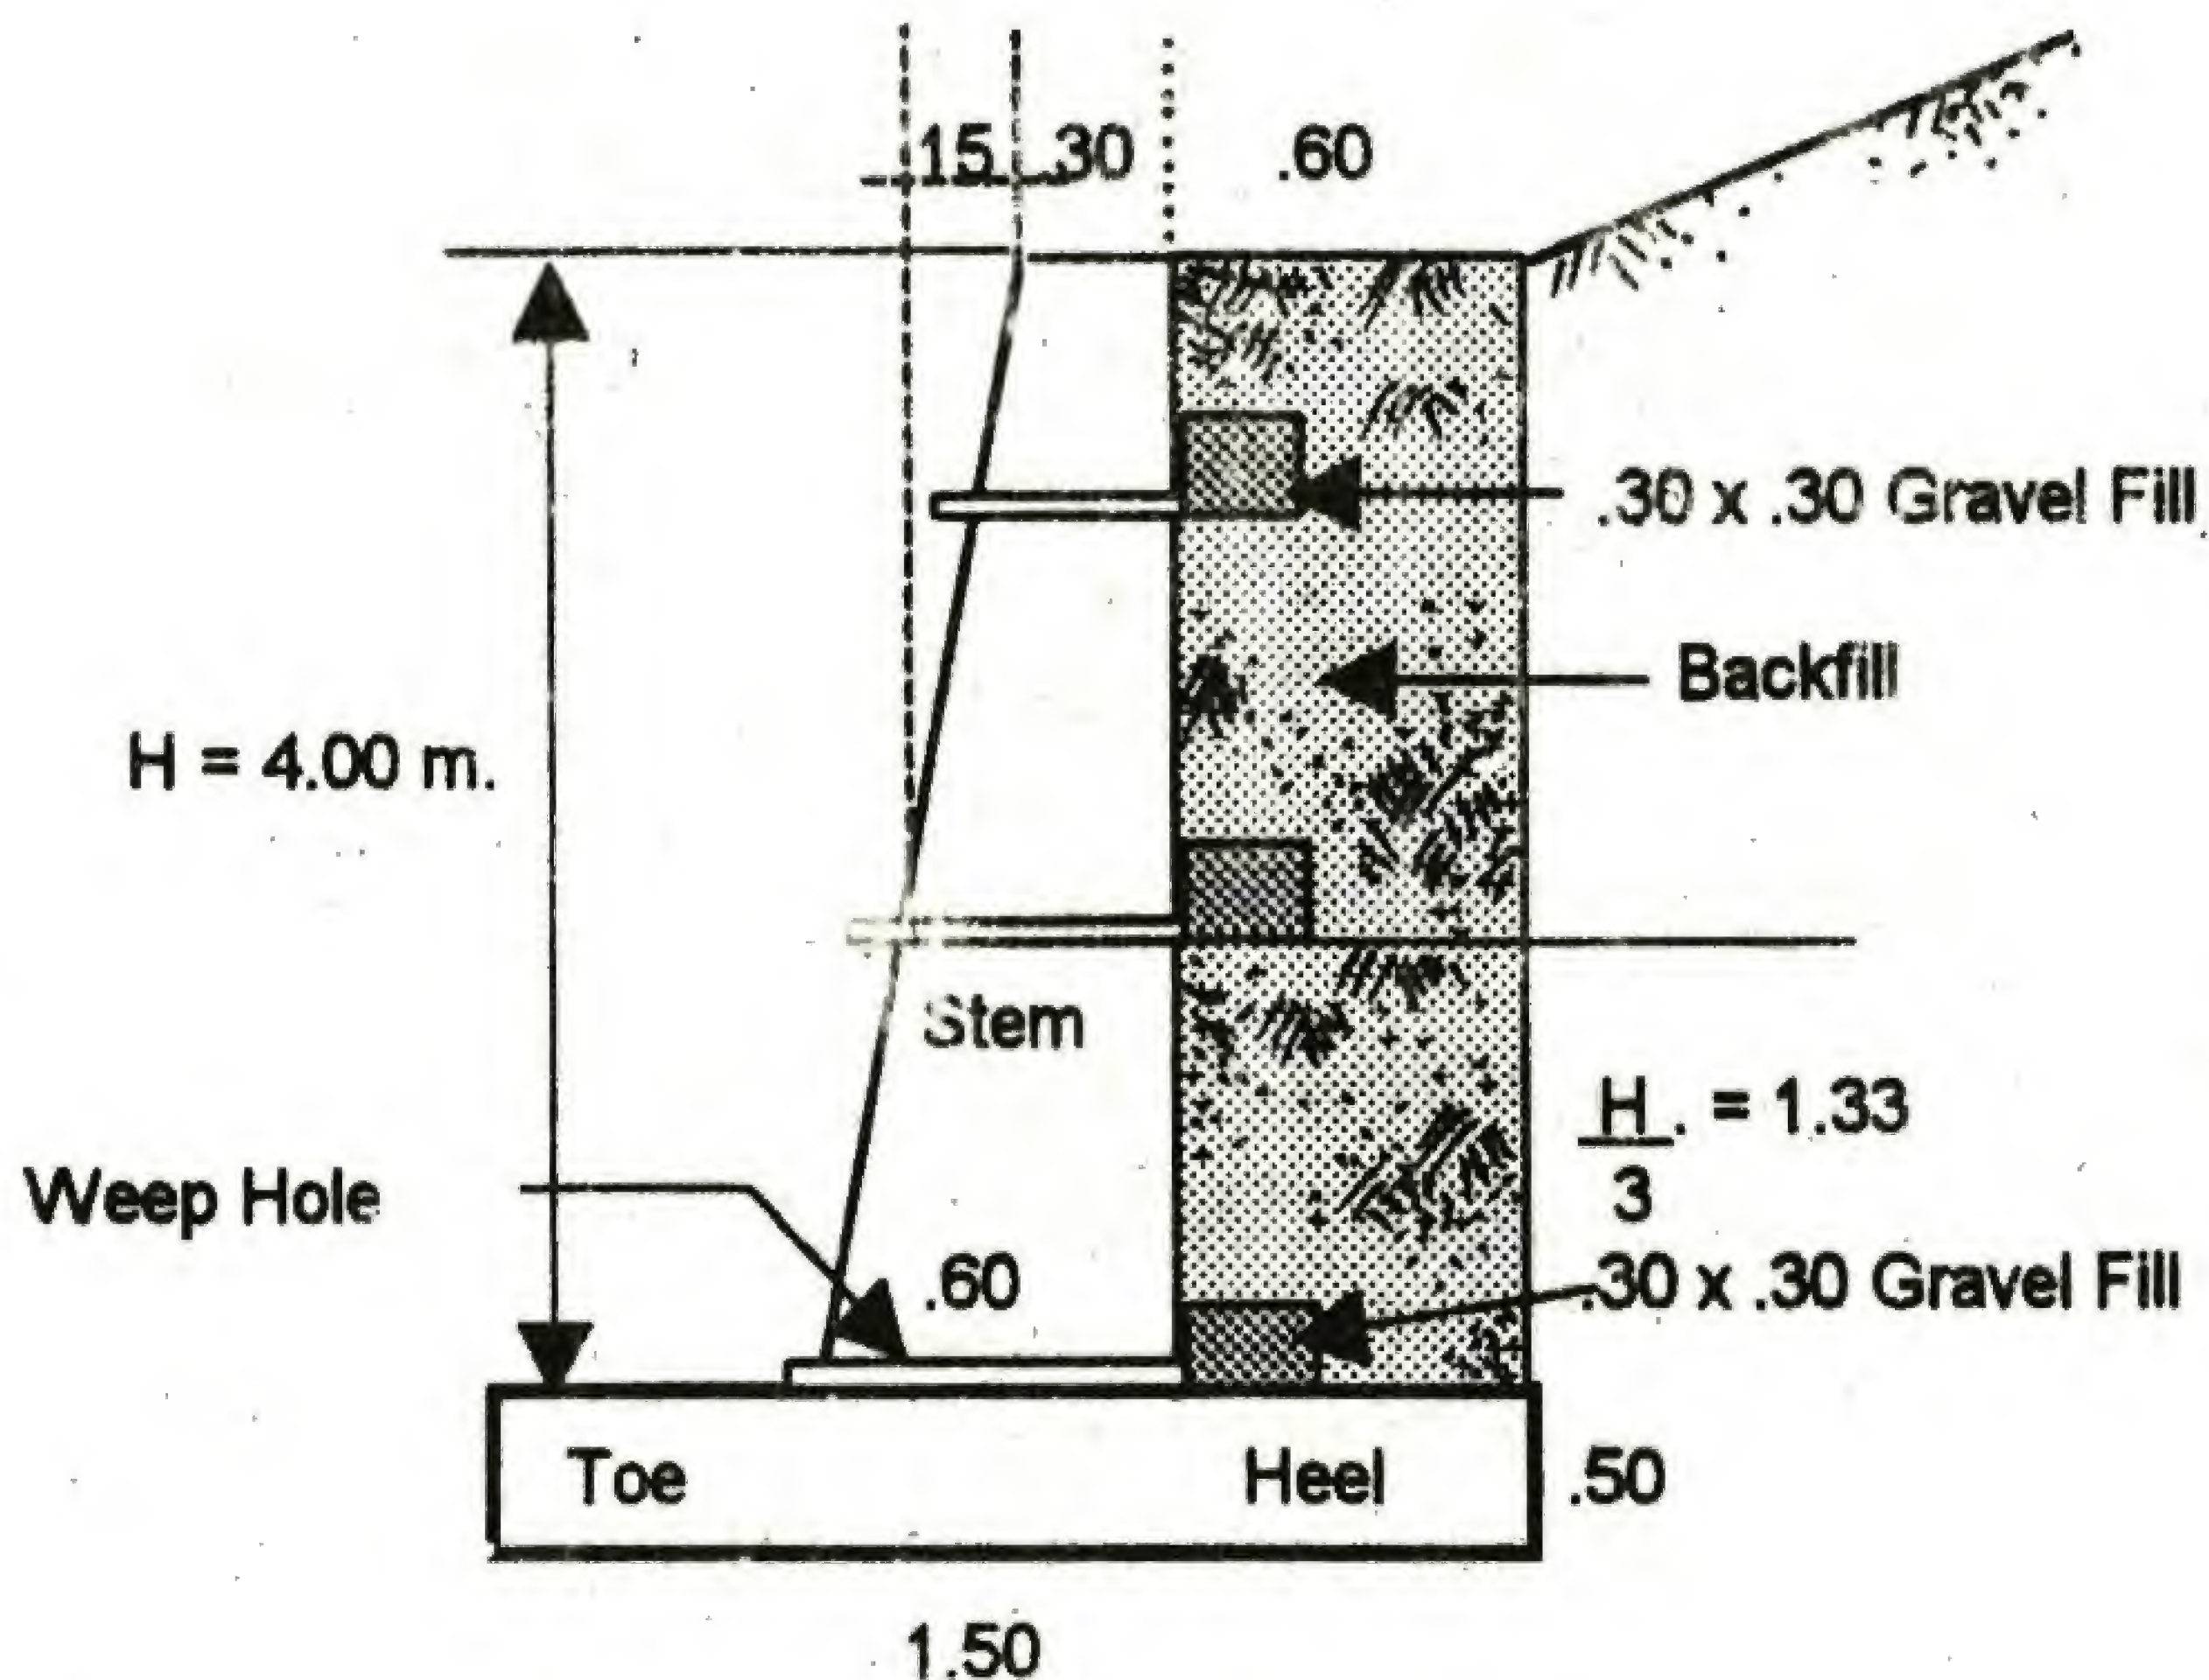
CROSS SECTION OF RETAINING WALL
